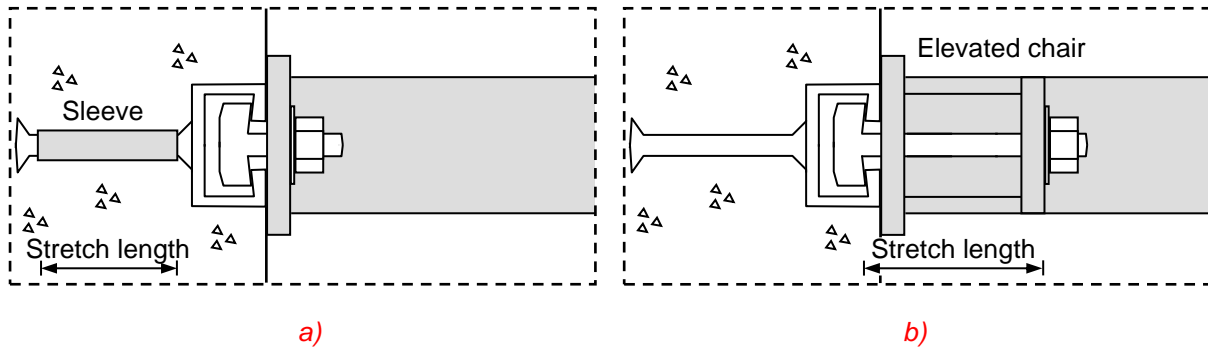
Possible location of free stretch length: anchor with sleeve or bolt resting on an elevated chair.
